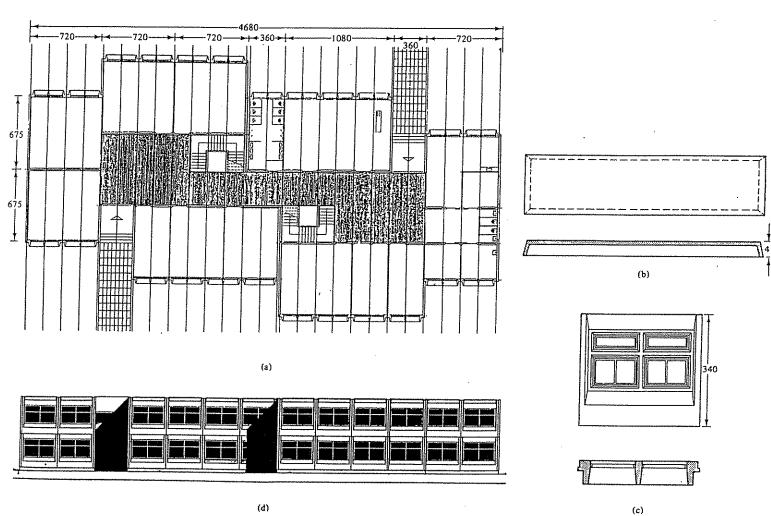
Yuval Gad school system (Israel): (a) general scheme, (b) casette floor element, (c) diamond-shaped exterior wall, and (d) picture.
